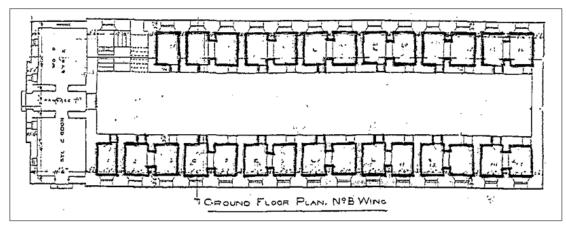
Ground Floor plan of B Wing. Diagram based on a 1925 plan with the modified cell arrangement indicated in bold over the original smaller cell arrangement.
